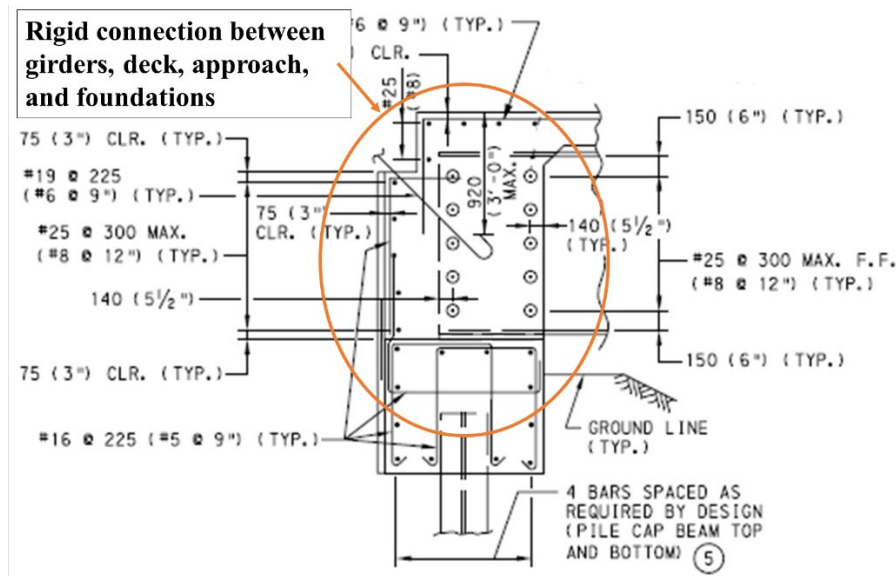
Modified example of integral abutment detail (PennDOT, 2007)
